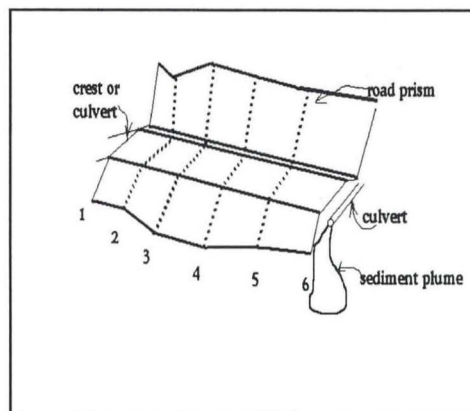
Representative road prism showing 6 cross-sections dividing the roadway into 5 equal segments.
